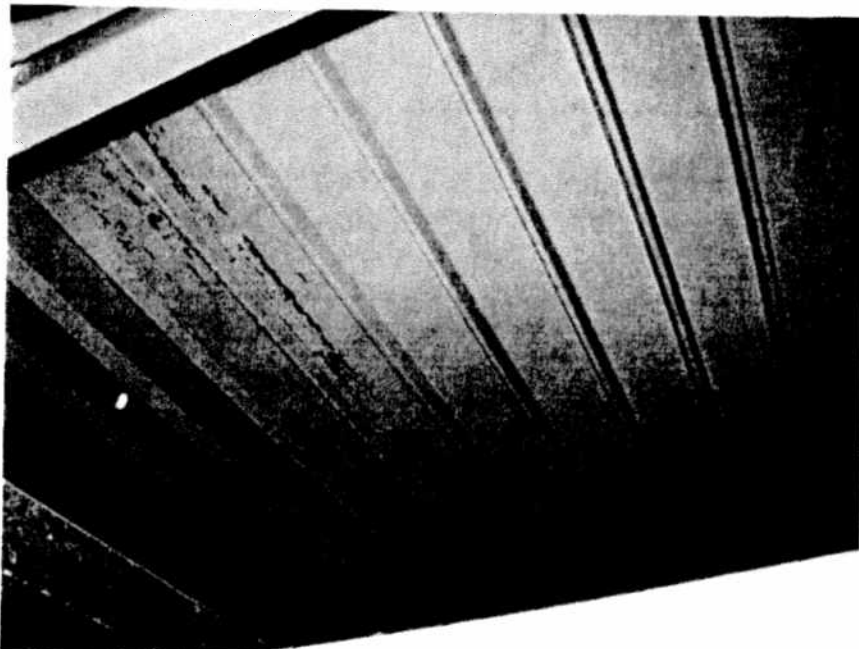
View of plenum above drop ceiling typical throughout the facility. Note minor paint chipping exposing steel primer coating observed in less than 5% of total observed surface area.
